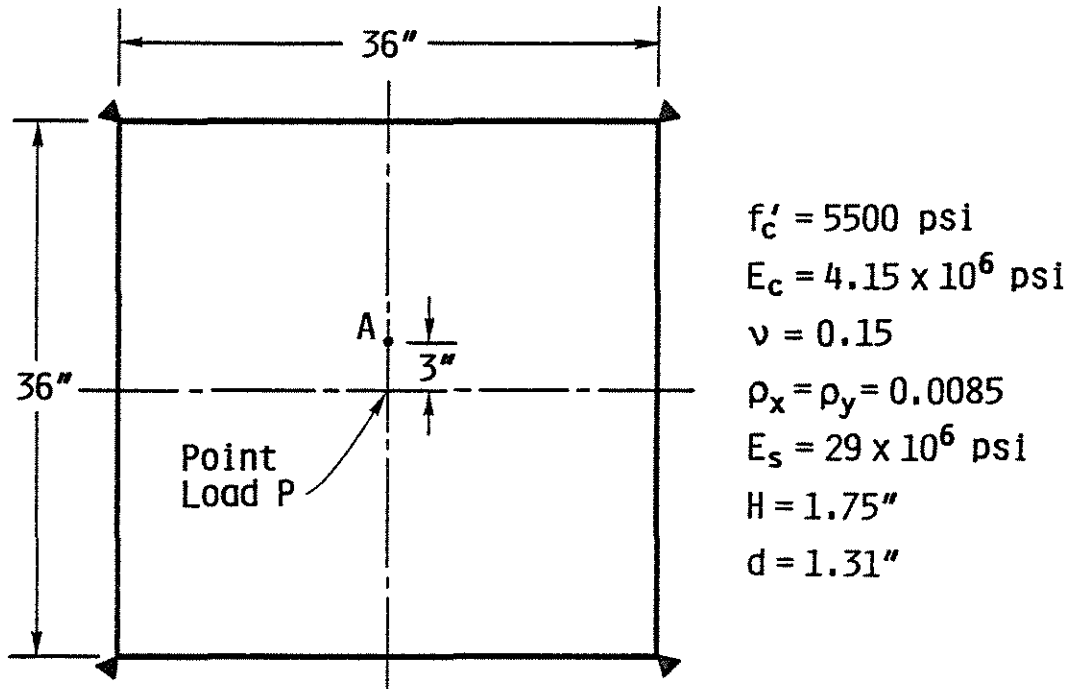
Corner Supported, Center-Point Loaded Two-Way Slab, McNeice (23).
